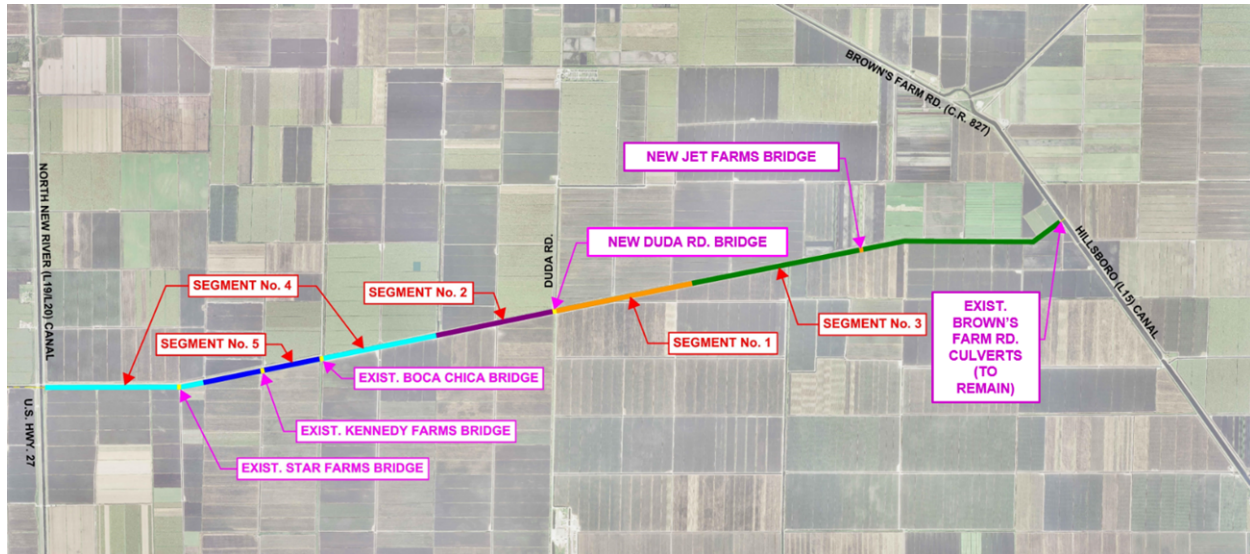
A-4. Bolles East (L-16) Canal Conveyance Improvement segments and bridges.
